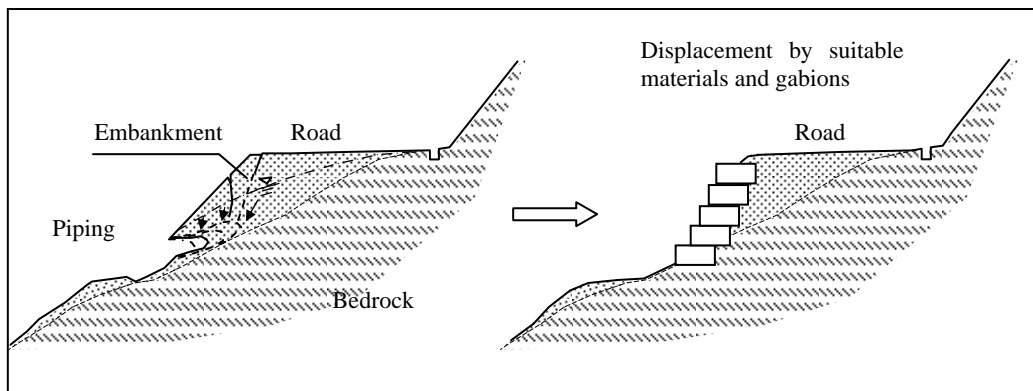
Embankment Failure caused by Piping at the Toe of Slope and Its Countermeasure Image (Source: JICA Study Team)
